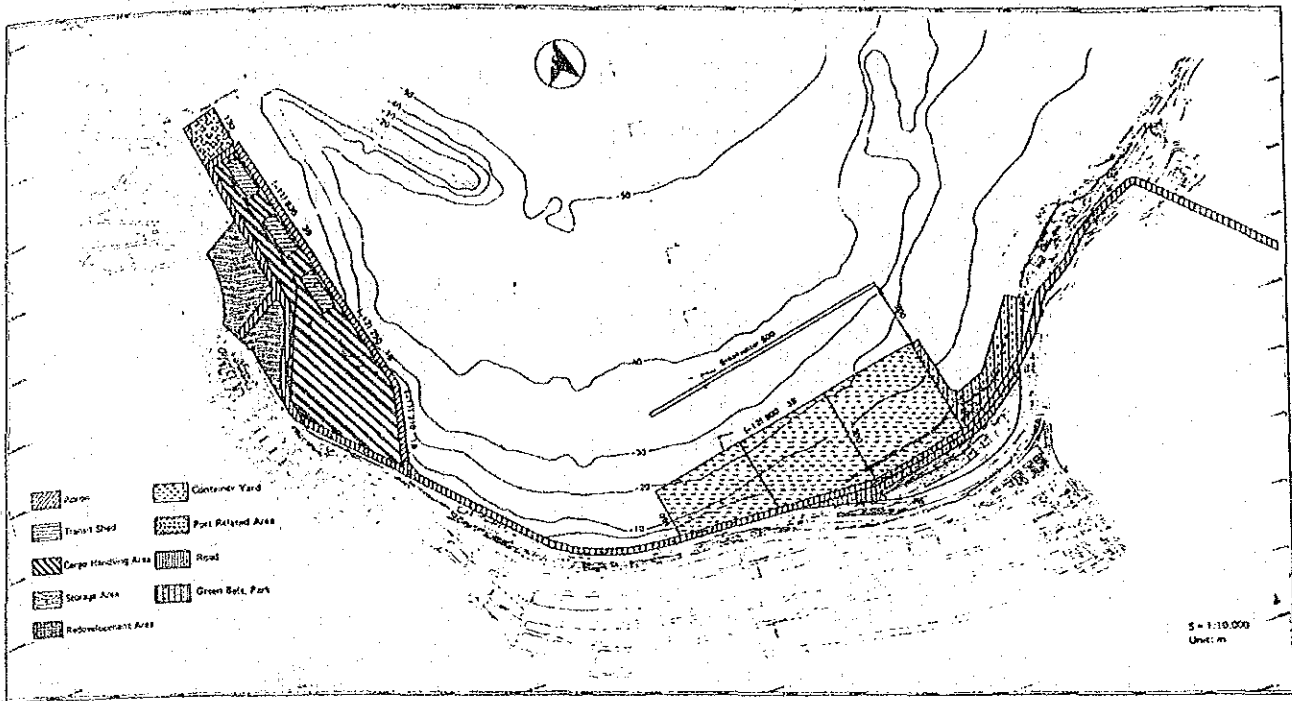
Master Plan of Valparaiso Port (2010) Plan A
